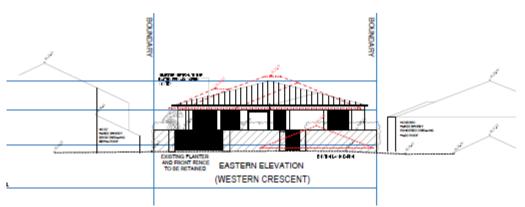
Proposed eastern elevation (existing building outline shown in red)
